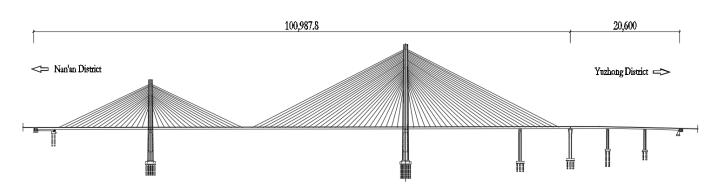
The bridge type layout of Nanjimen Yangtze River Track Special Bridge (unit: mm).
